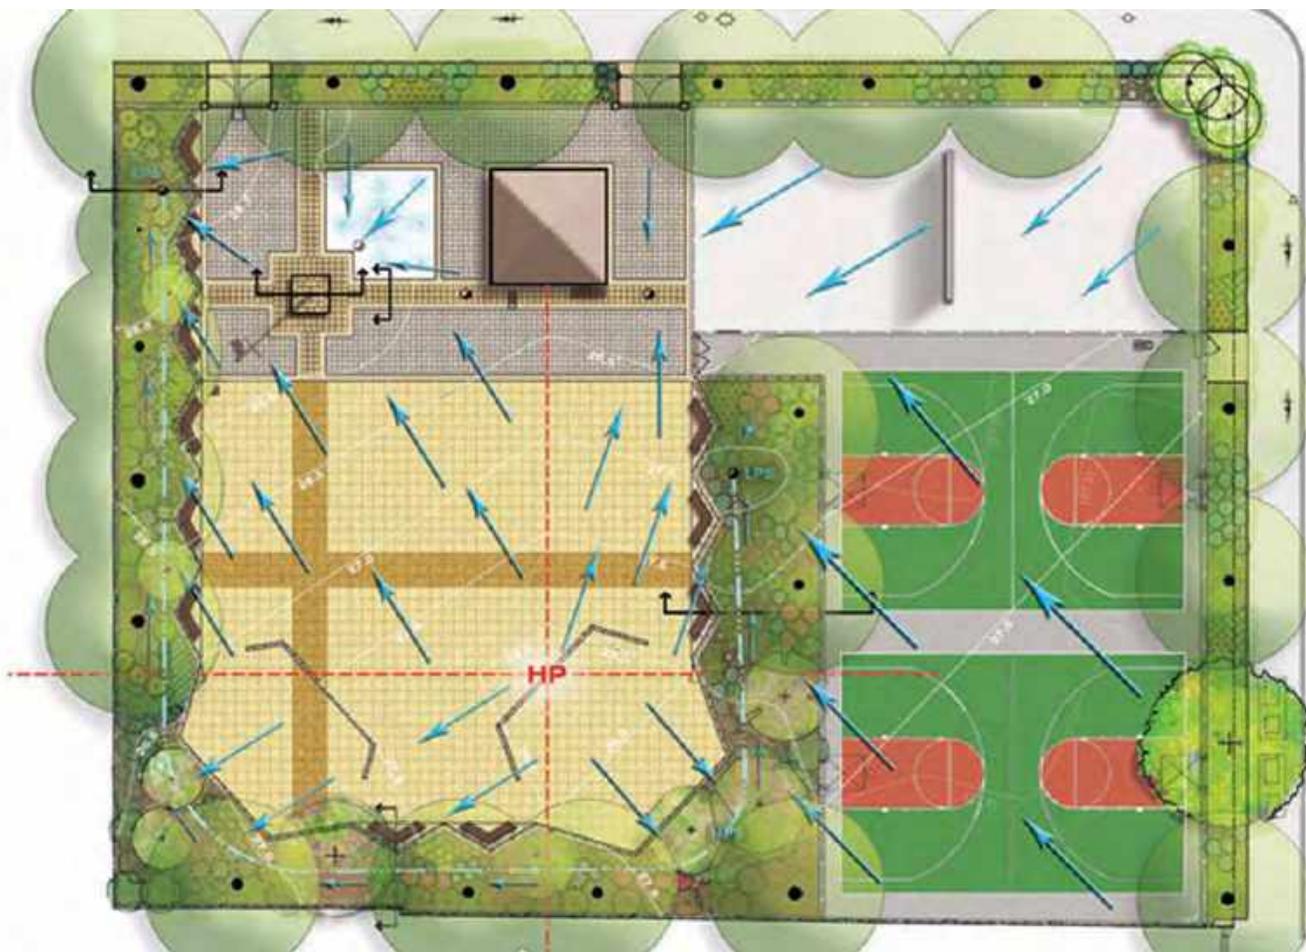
Plan: Pearly Gates Park Renovation (Source: NYC Parks and S. Koren)
